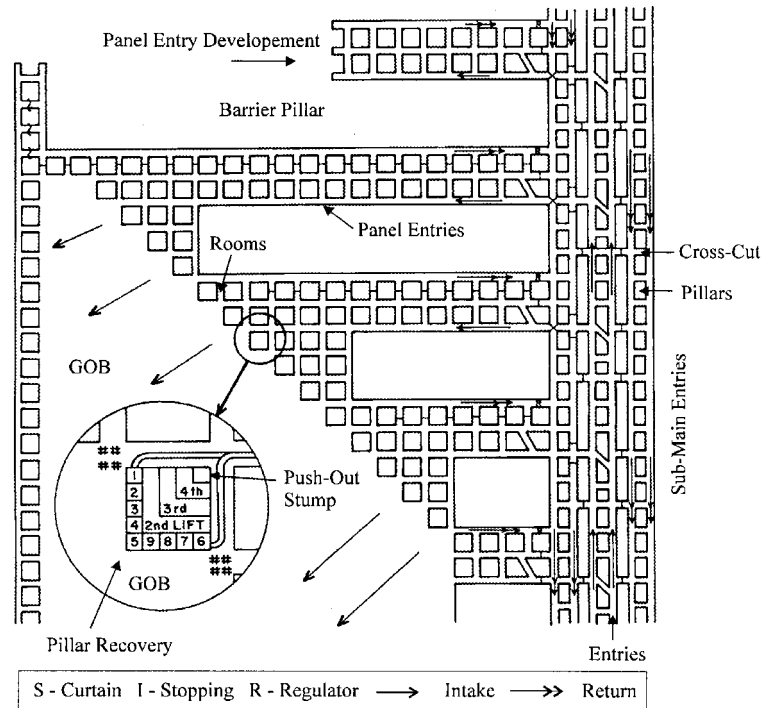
Plan view of a typical room and pillar mining panel in the U.S. (Stefanko, 1983).
